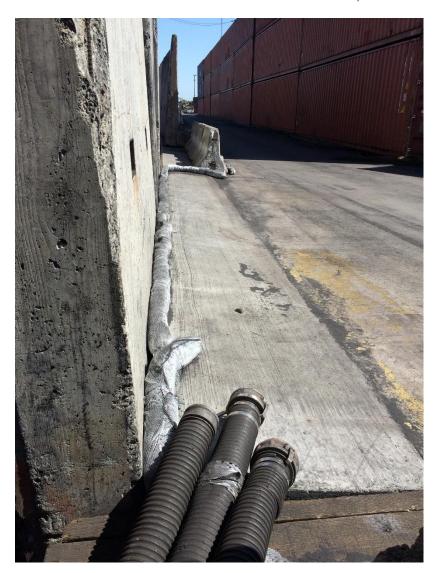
Looking north along western alley of secondary storage area: new concrete extending road in an area that was formerly gravel and timbers.
